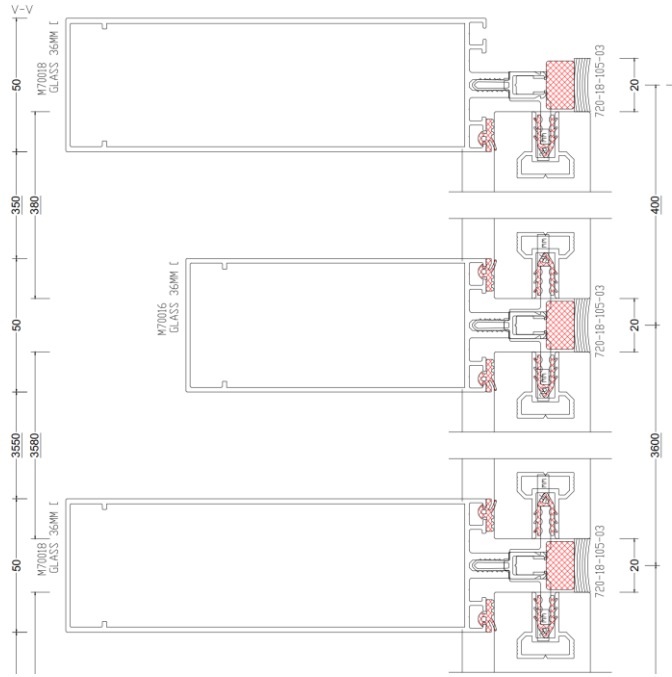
Section drawing detail of curtain wall used in 3D modelling (closer image).
